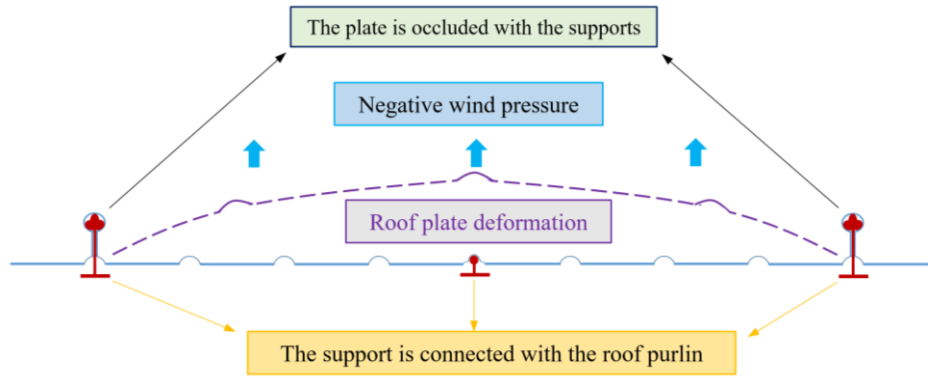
The wind load transfer way of standing seam metal roofing plate
